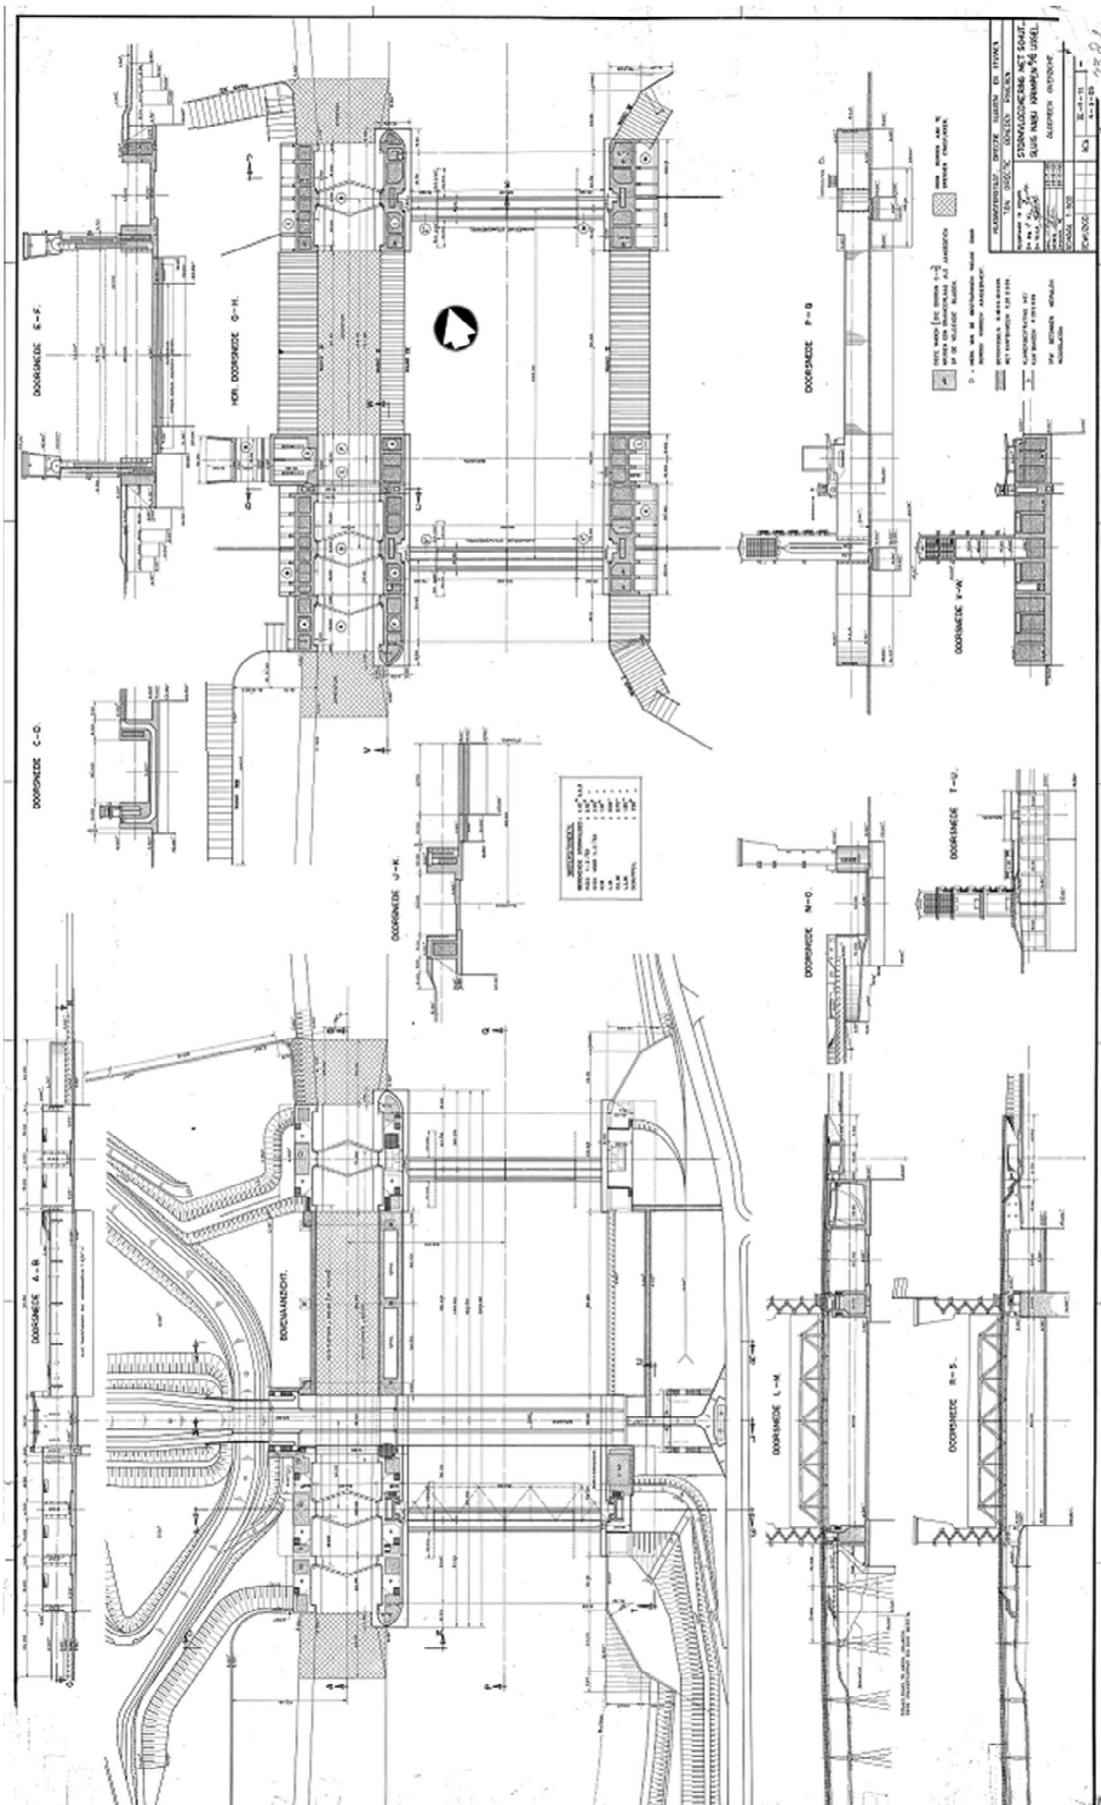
Technical drawing overview storm surge barrier 1978, source; Rijkswaterstaat
